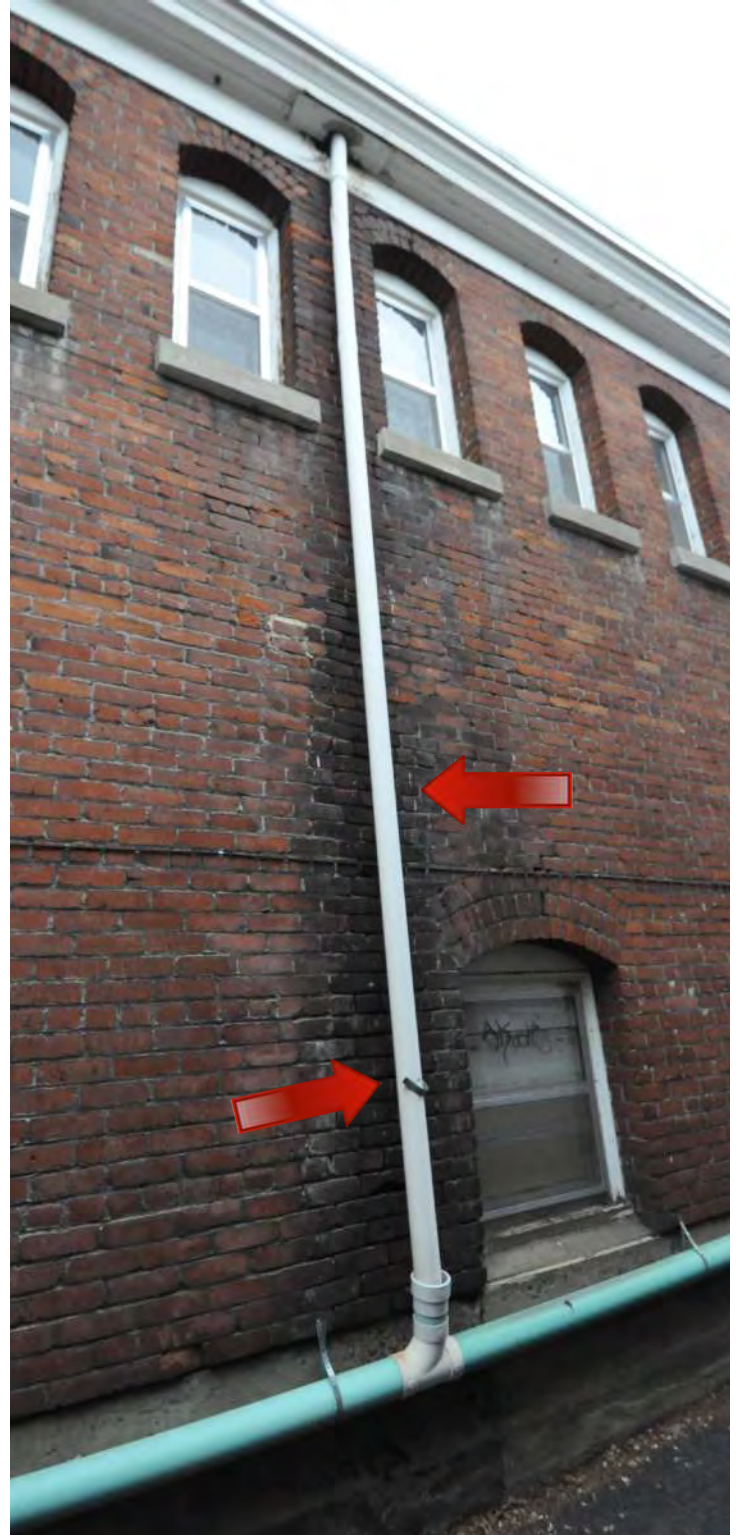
Similar to Figure 41, this downspout pipe also shows significant mortar erosion and brick damage due to the broken downspout leader shown in Figure 43. Also note the broken anchor strap.
